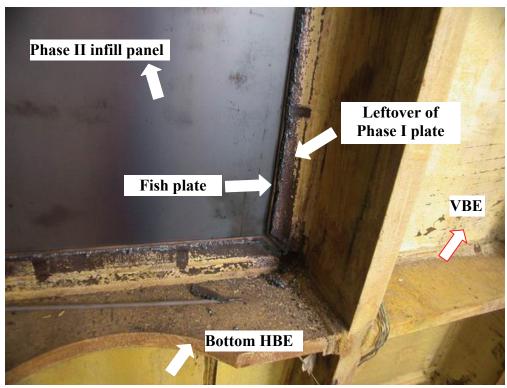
Detail of Fish Plates after the Infill Panel Installation
